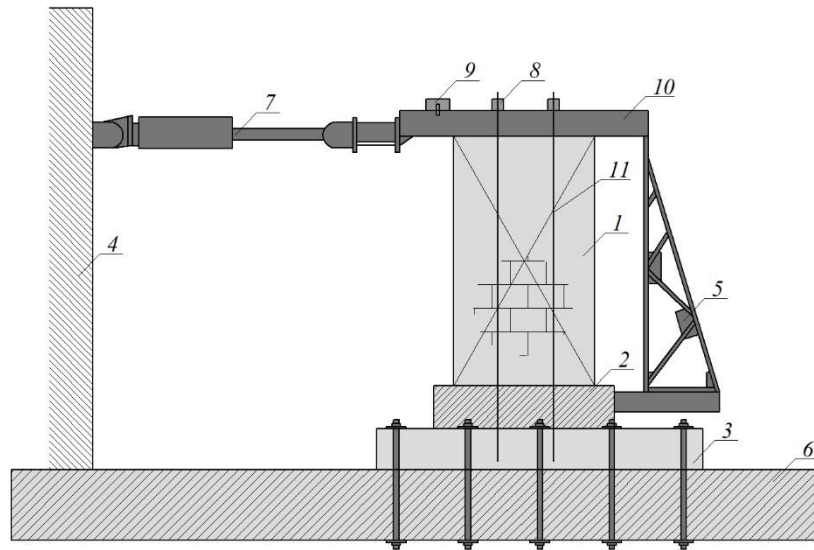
Test stand in research [149]: 1 – tested wall, 2 – wall foundation, 3 – concrete slab, 4 – steel reaction frame, 5 – truss, 6 – rigid structural floor, 7 – hydraulic actuator, 8 – hydraulic jack, 9 – out of plane bracing, 10 – U-shape loading beam, 11 – post-tensioned steel tendons
